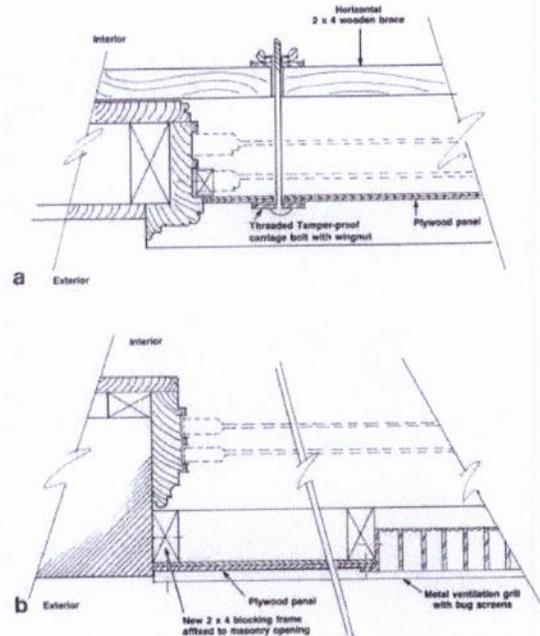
A: Plan detail showing plywood security panel anchored with carriage bolts through to the inside horizontal bracing, or strong backs. B: Plan detail showing section of plywood window panel attached to a new pressure treated wood frame set within the masonry opening. Ventilation should be included whenever possible or necessary.
